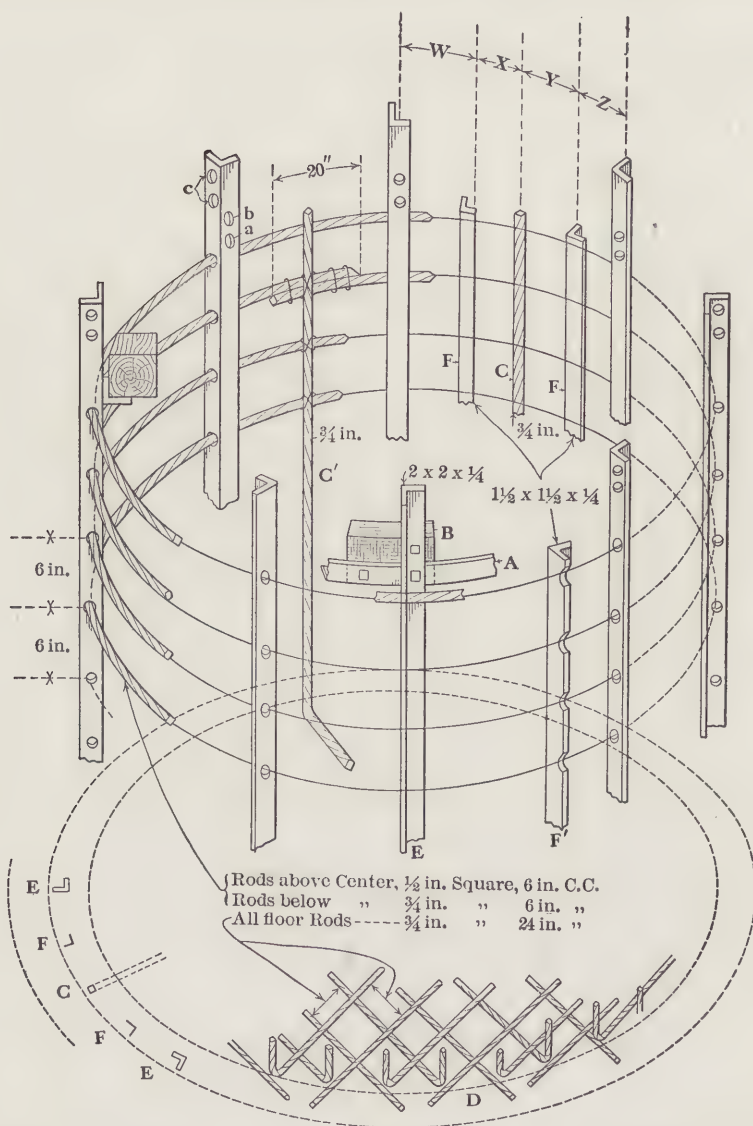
PARTIAL SKELETON OF STEEL REINFORCING OF CONCRETE RESERVOIR
